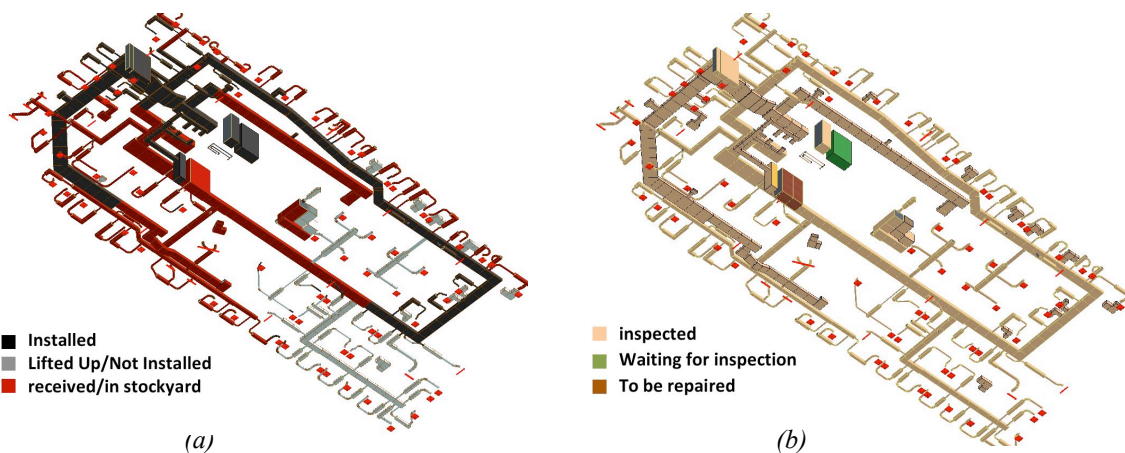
HVAC 3D drawing of one floor of the JMSB building:
